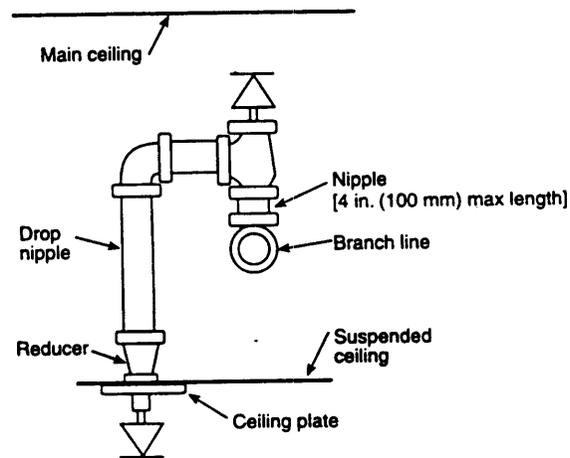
(b) Sprinklers in concealed space and below ceiling.
